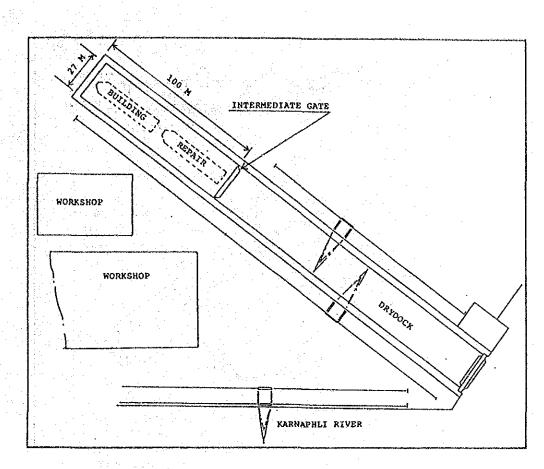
Expantion of Existing Dock ( PLAN "A" )
